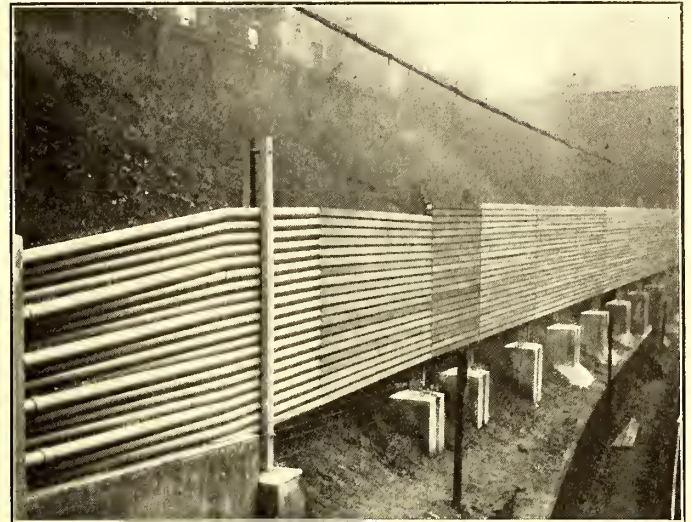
CABLE TROUGHING CONSTRUCTION, HIGH STREET TUNNEL, LOOKING WEST
